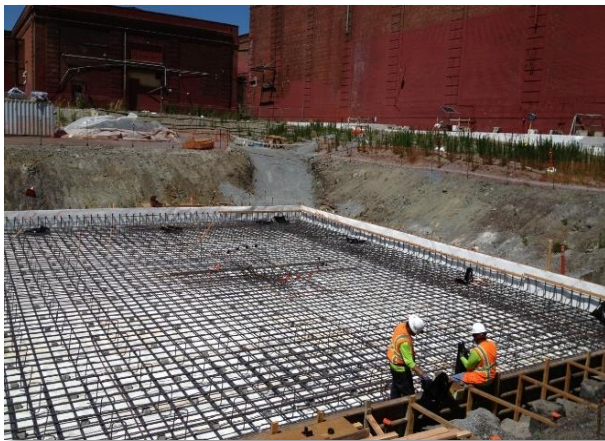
GIS building foundation in Potrero Switchyard, July 16, 2015
